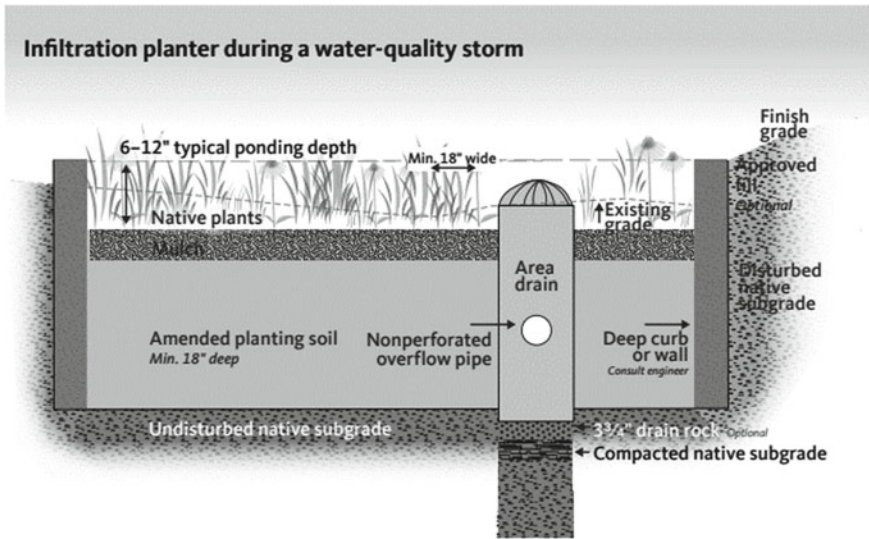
Infiltration stormwater planter design (Modified from: Cahill et al. 2011)
